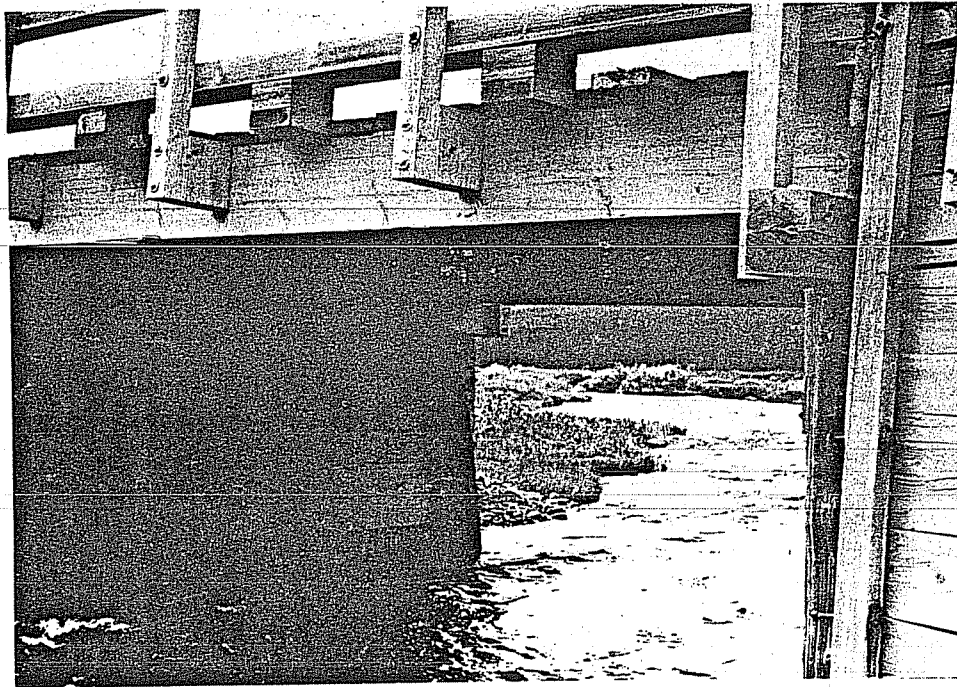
DENALI HIGHWAY BRIDGE. TYPICAL WOOD-FRAME STREAM CROSSING
